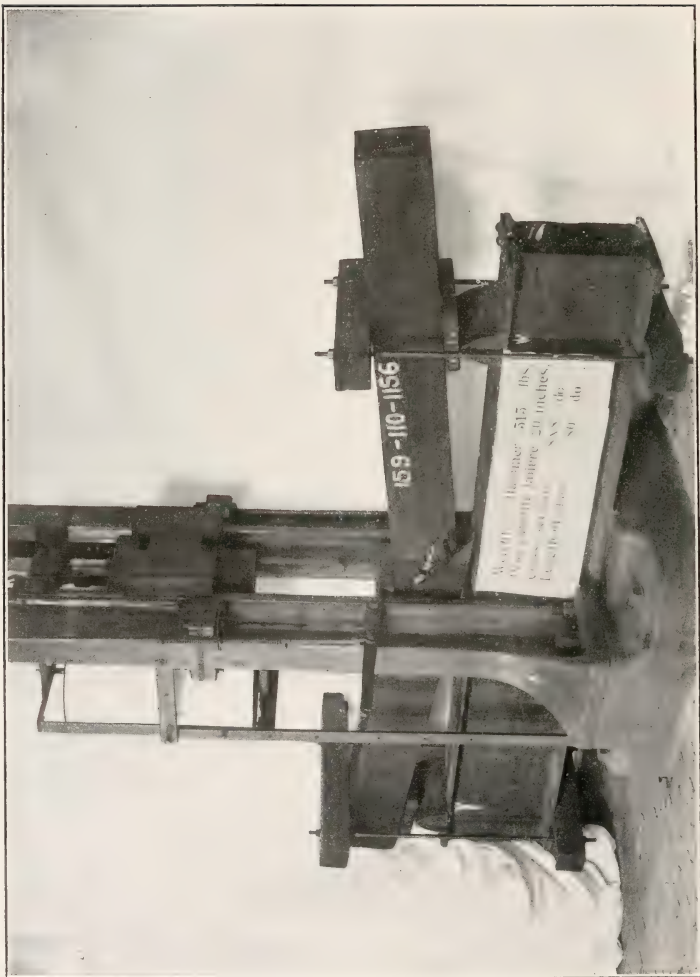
Testing a yellow pine bridge tie; impact loading
